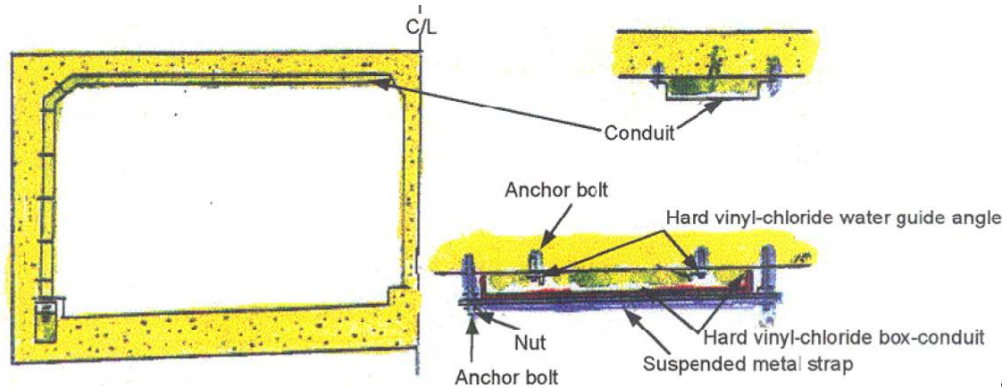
Hard vinyl-chloride box conduit anchored to underside of cast-in-Place concrete roof to convey water leakage (Russell, 2001).
